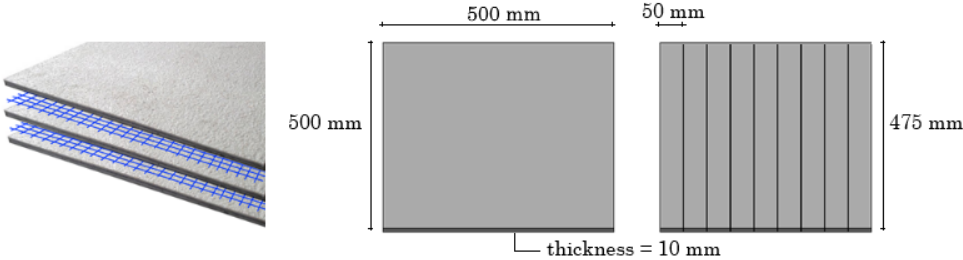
TRC composition using a hand lay-up technique and cutting of the specimen out of plates
